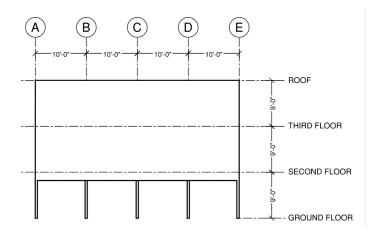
Short-side elevation of the design example three-story, short-side-open building.
